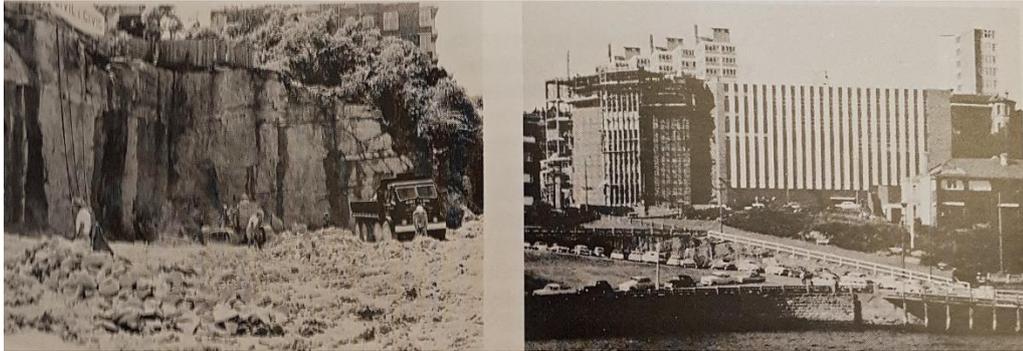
Stage One excavation (left) and progress to date on Stage Two and Three (right). (Source: College by the Harbour)
